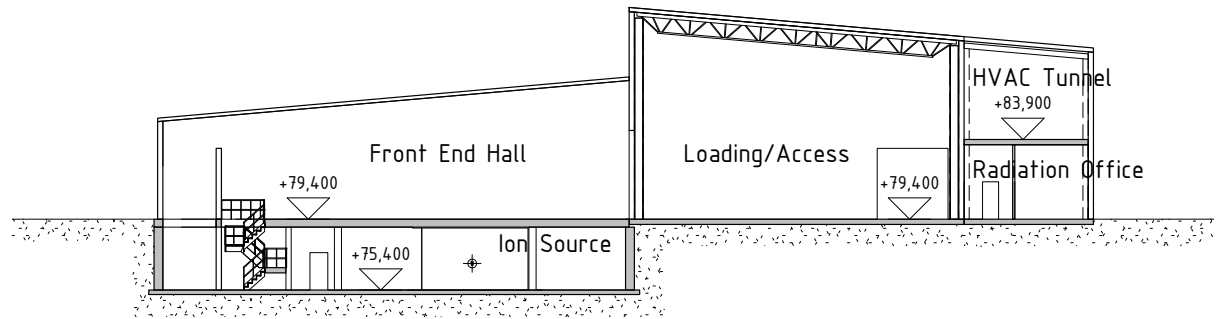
Klystron gallery cross section at the front end building (northeast end of tunnel).
